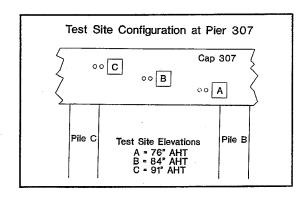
Test site configurations, Pier 307. The squares denote anode test windows; small circles denote location of rebar test probes. Elevations indicated are above high tide (AHT) level.
